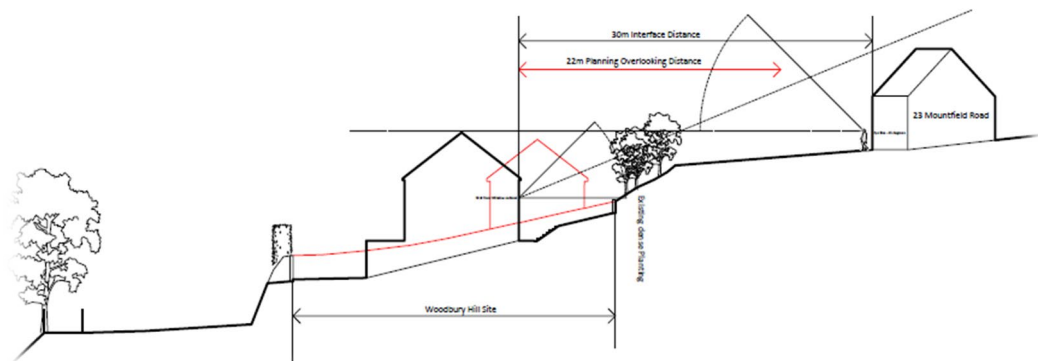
Proposed Sectional Drawing showing the development in relation to No. 23 Mountfield Road
